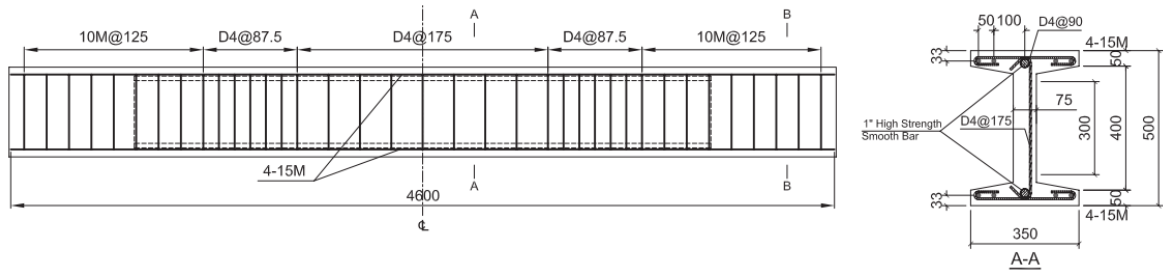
Shear reinforcement in the beam LB6 [13]
